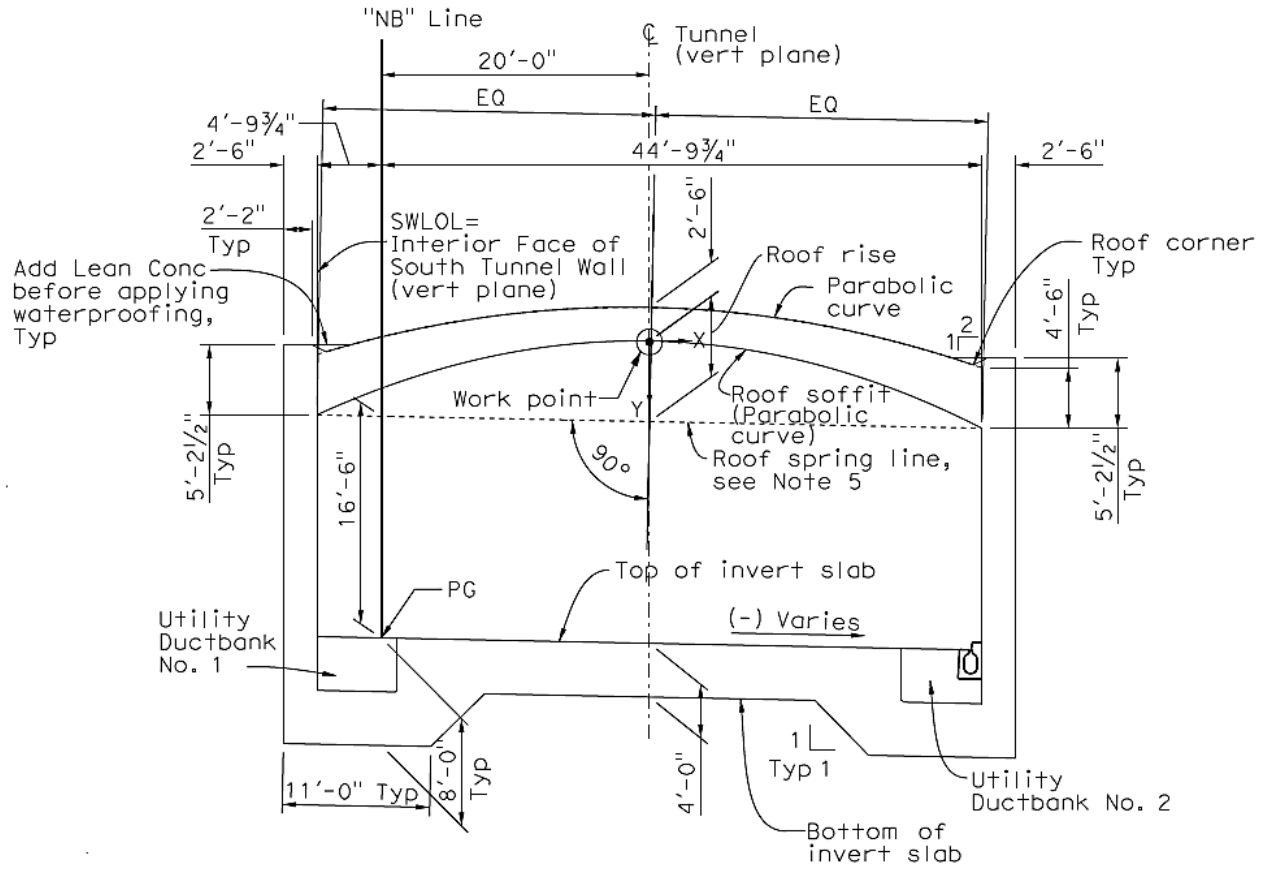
Configuration of the Doyle Drive Battery Tunnel cross-section
